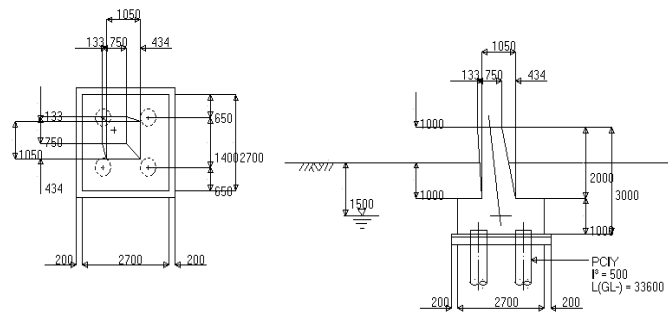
Assumed Design of Pile Foundation for TDL
